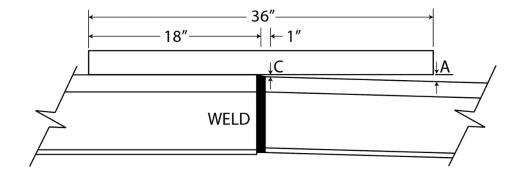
Vertical Weld Grind Tolerances
